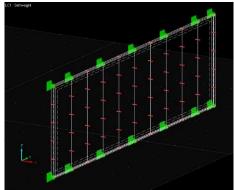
TES panel - 80 cm mullions spacing, 7 wall anchors, 6 screws per mullion.
